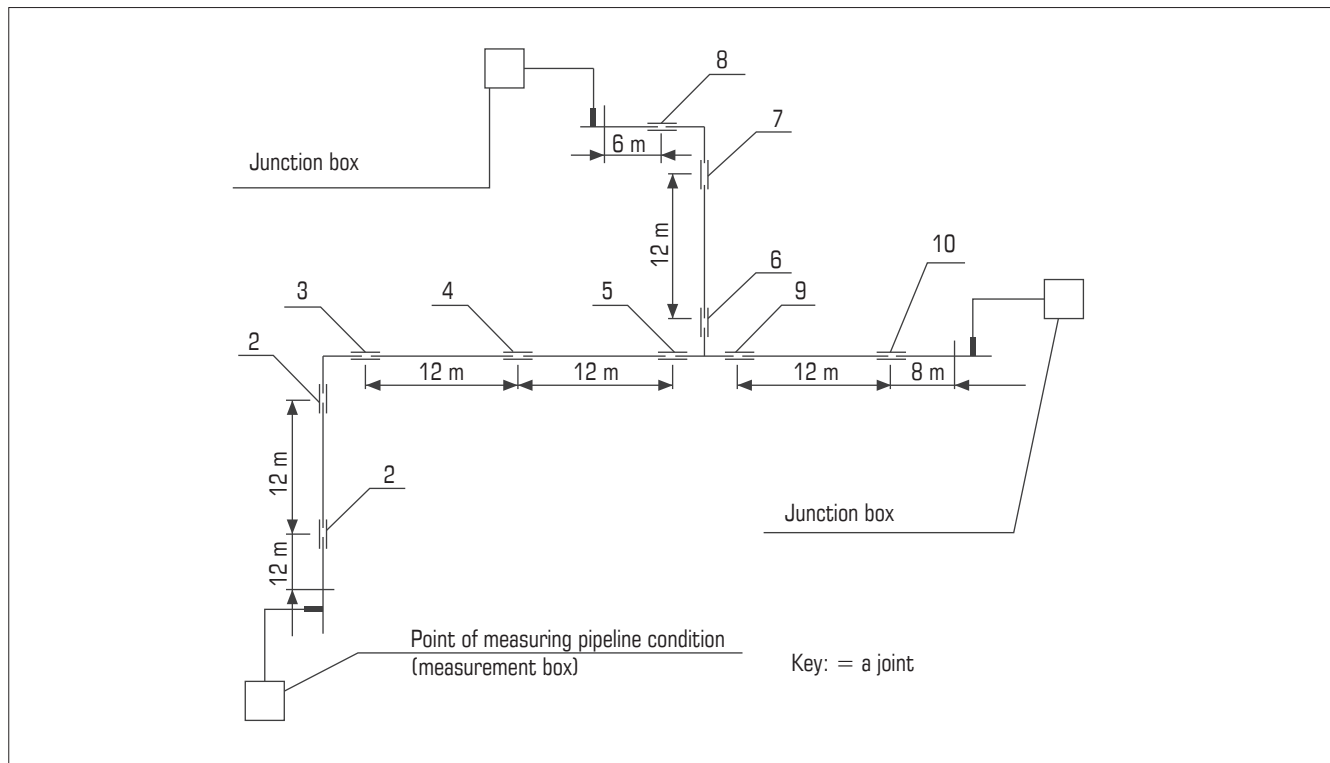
The principle of marking connections in the pipeline assembly drawing
